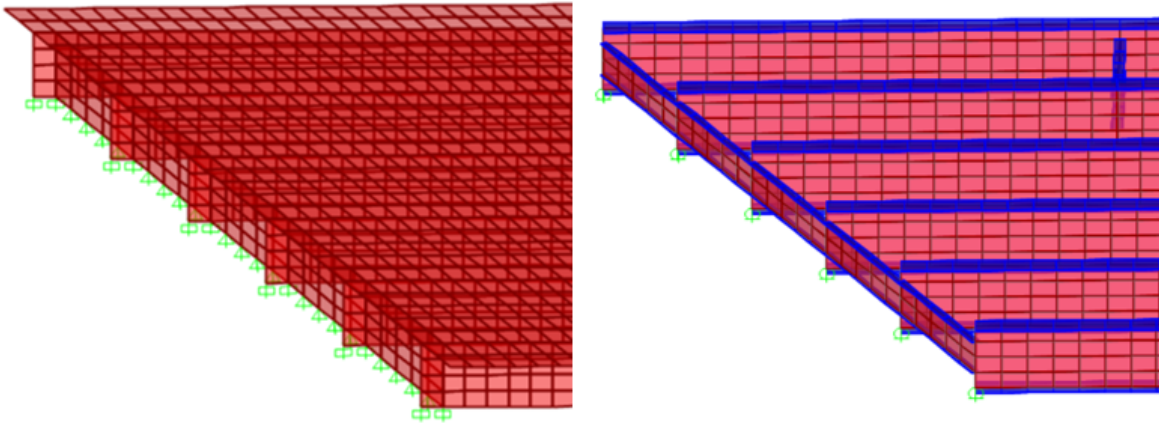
Boundary conditions for the concrete girders on the left and the steel girders on the right
